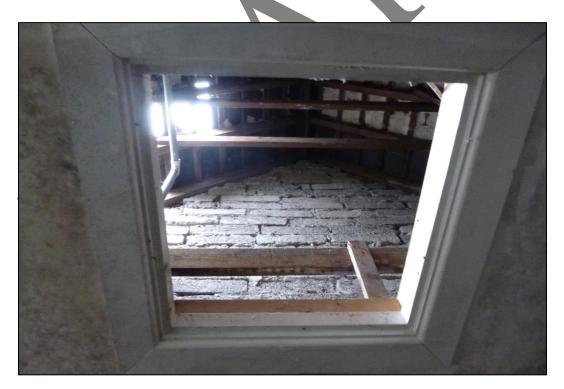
View through attic hatch to NE concrete block gable, original roof timbers and lime mortar torching (18.02.2025).
